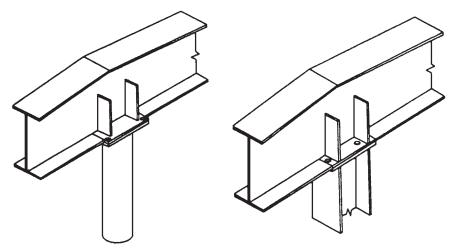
Connection of interior columns to rafter in multiple-span rigid frames. (Steelox Systems Inc.)
